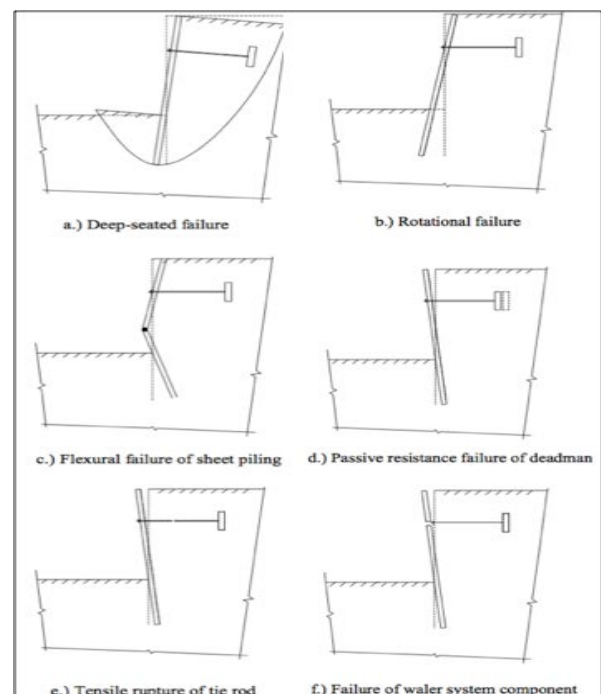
Failure modes for anchored sheet pile walls [4]
